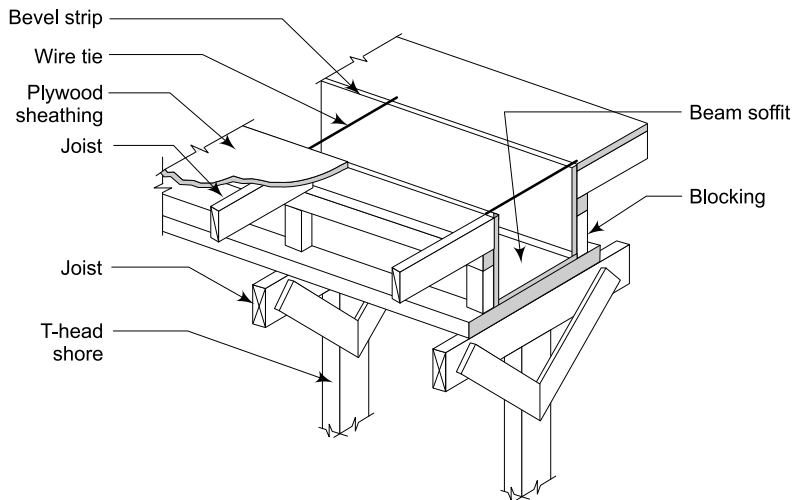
Typical Components of Beam Formwork with Slab Forming in.
